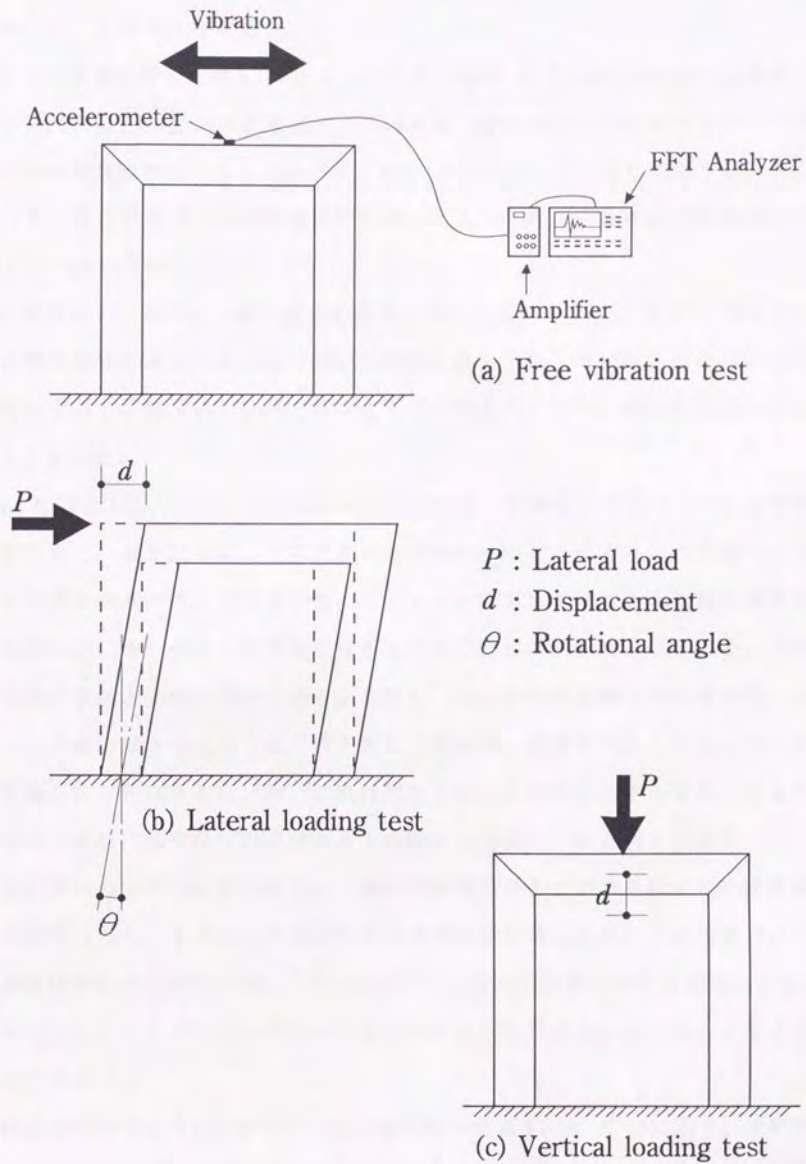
Schematic diagrams of testing for frame-shape specimen.
